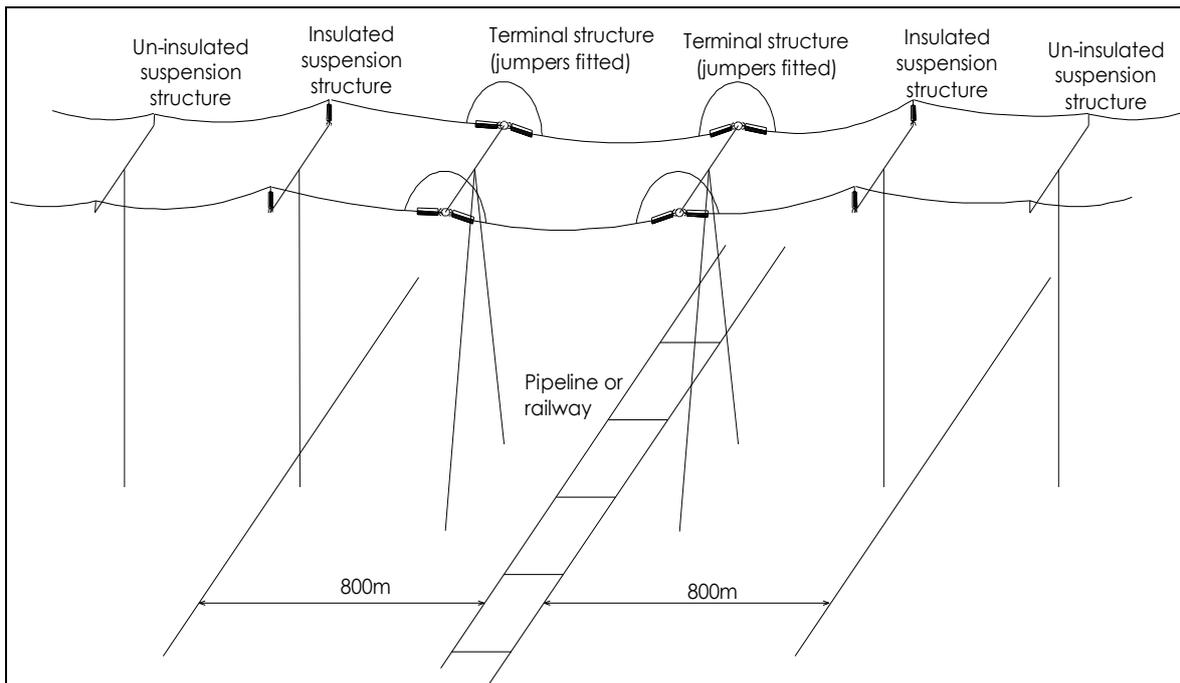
Insulation of shield wires on suspension and strain towers crossing railway lines or pipelines
